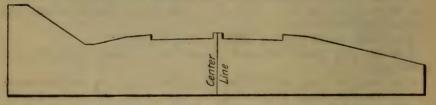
Transparent Templet with Stone Trench Cut; Saves Time in Drawing in Sections for Figuring Cut and Fill
